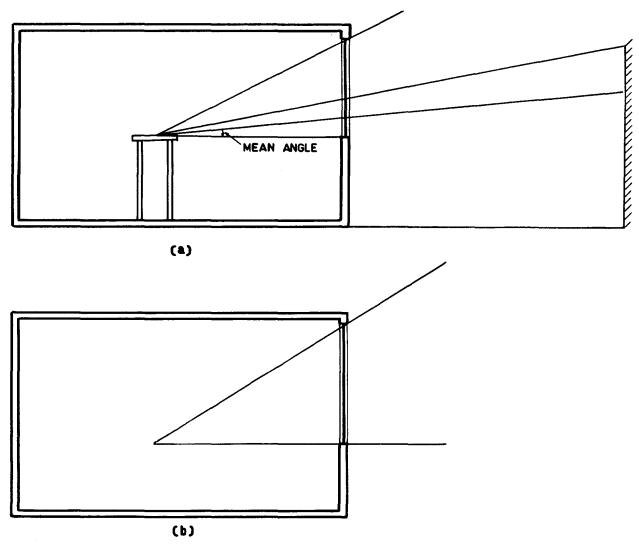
Illustration Depicting Use of Protractors on (a) Sectional Elevation and (b) Plan in Presence of External Obstruction (Example 16)
